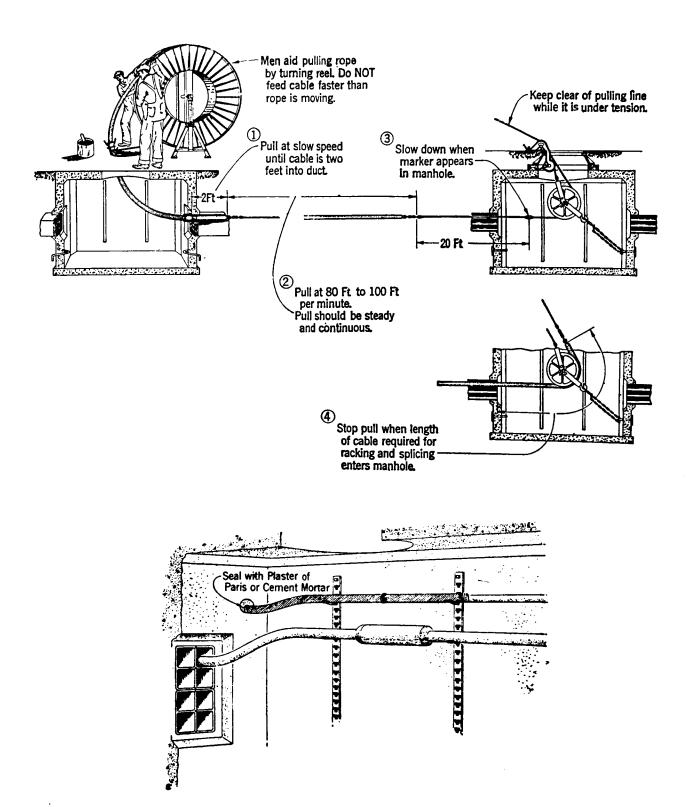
SEALING DUCTS AND MANHOLES
